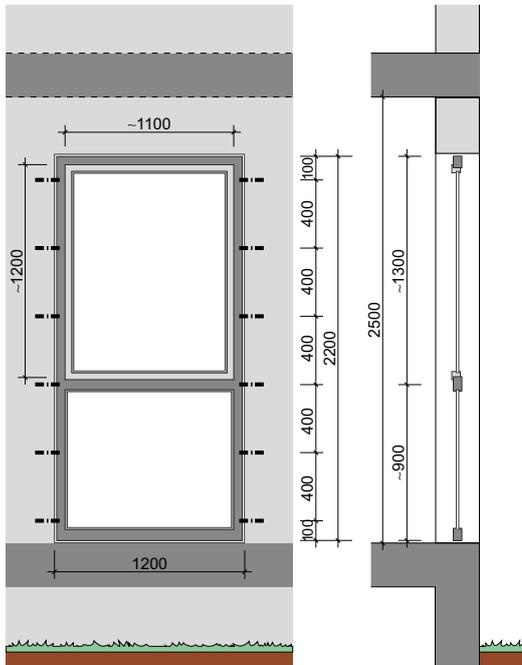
Schematic diagram of the fixing situation selected in the example: fall-protection window element with lower fixed glazing
